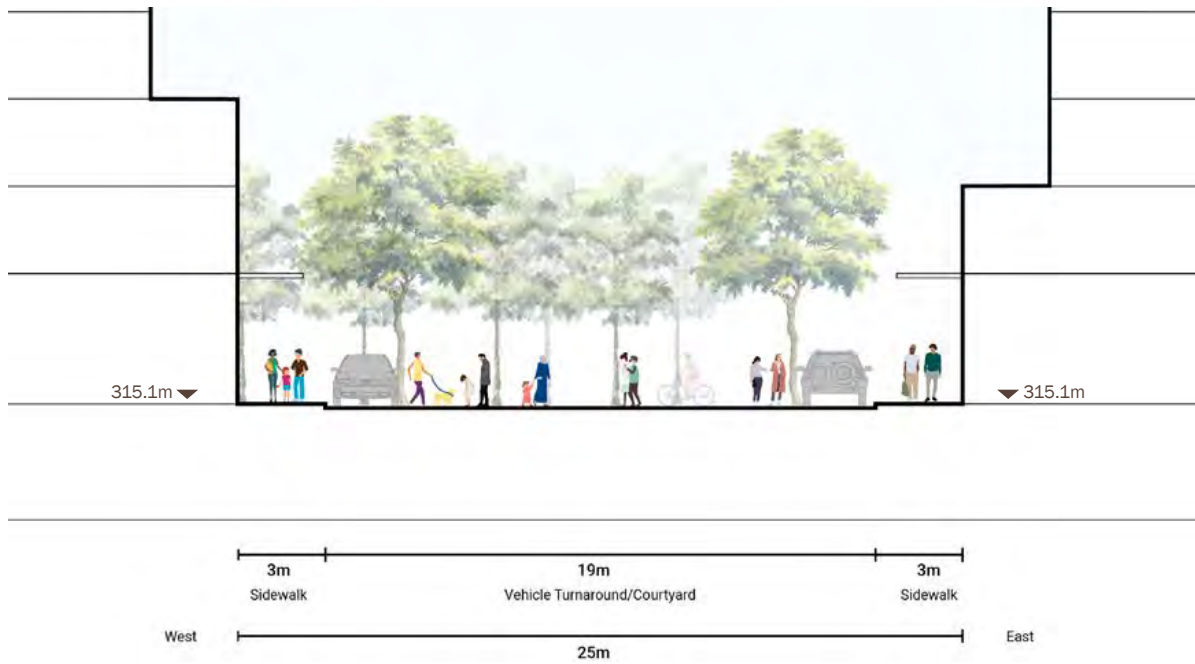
Huron Lane Plaza Cross-Section 2 Looking North
